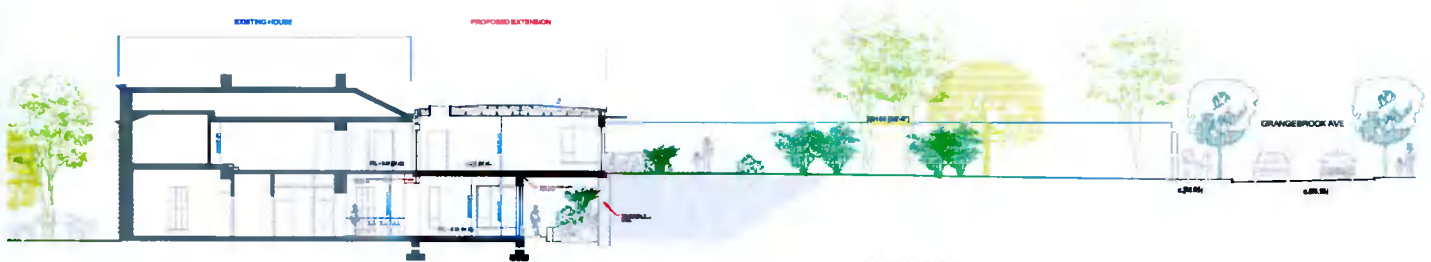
Drawings showing House + Extension - section through house to Grangebrook Avenue.
